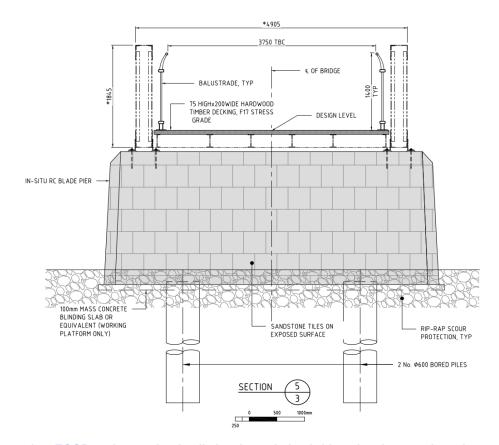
TGGP cycleway pier detail showing existing bridge pier shape and sandstone tiling
